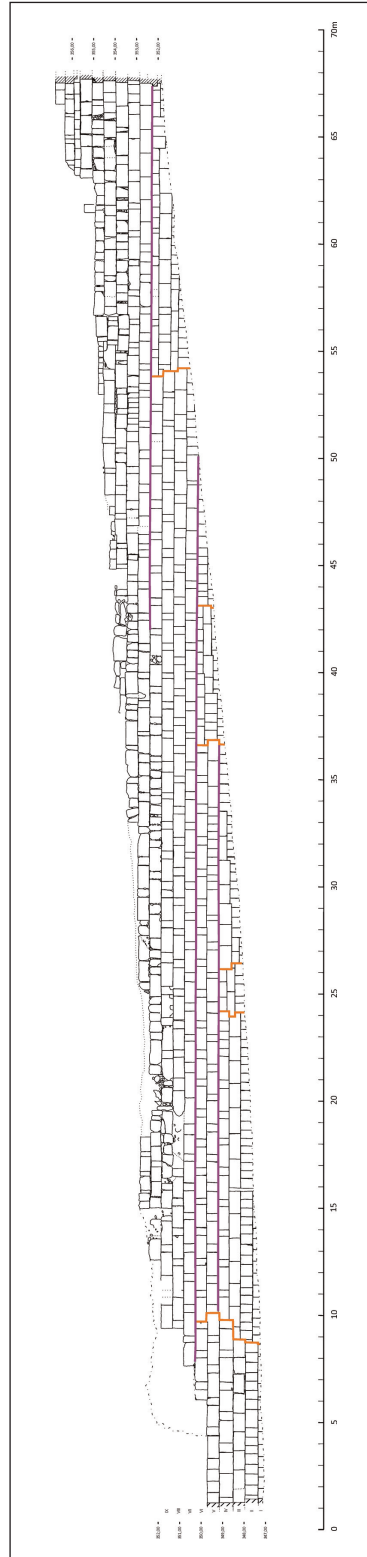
Curtain C, construction joints and horizontal joints running through larger sections.
